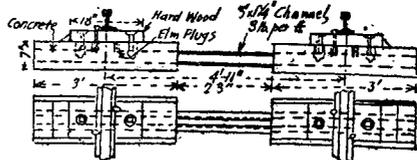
KIMBALL TIE IS COMPOSED OF TWO CONCRETE BLOCKS CONNECTED BY STEEL CHANNELS
